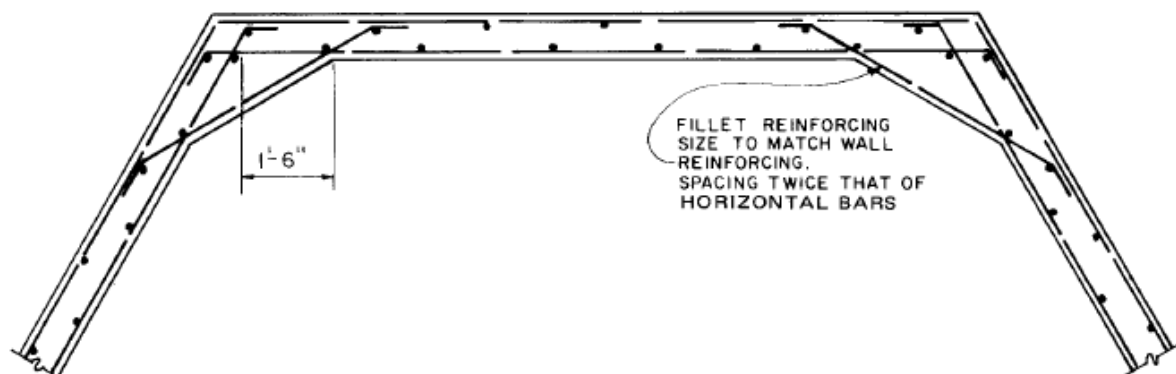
Hexagonal silo wall reinforcing (Example 16-5).
